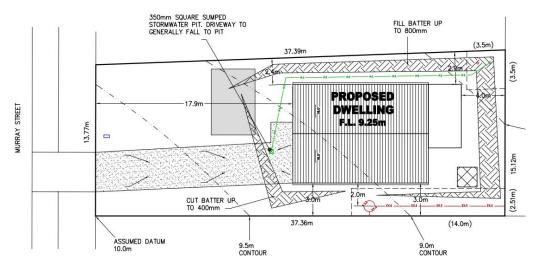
Proposed Site Plan (Source: Application Documents submitted with DA 2023/0184)
